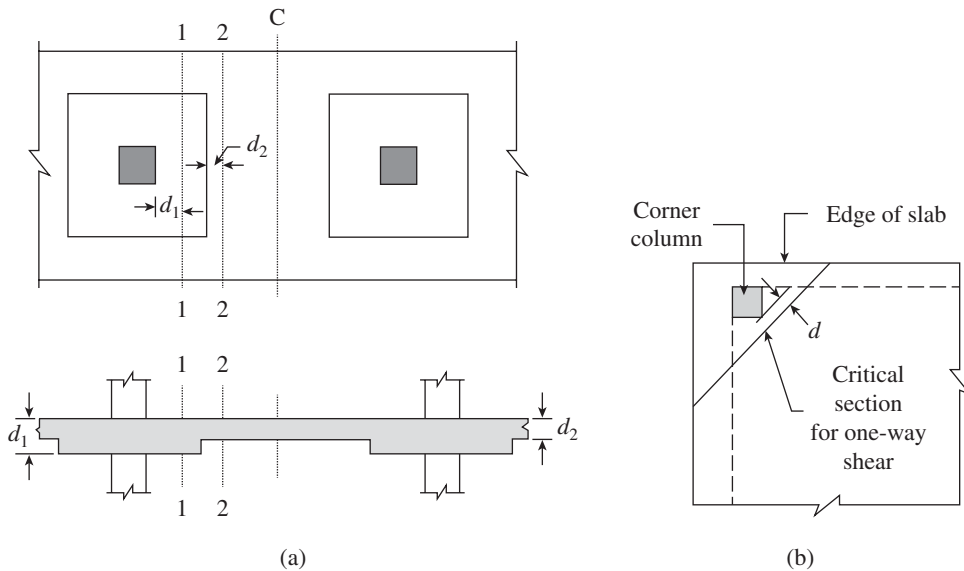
Critical section for one-way shear (a) Flat slabs (b) Corner column
